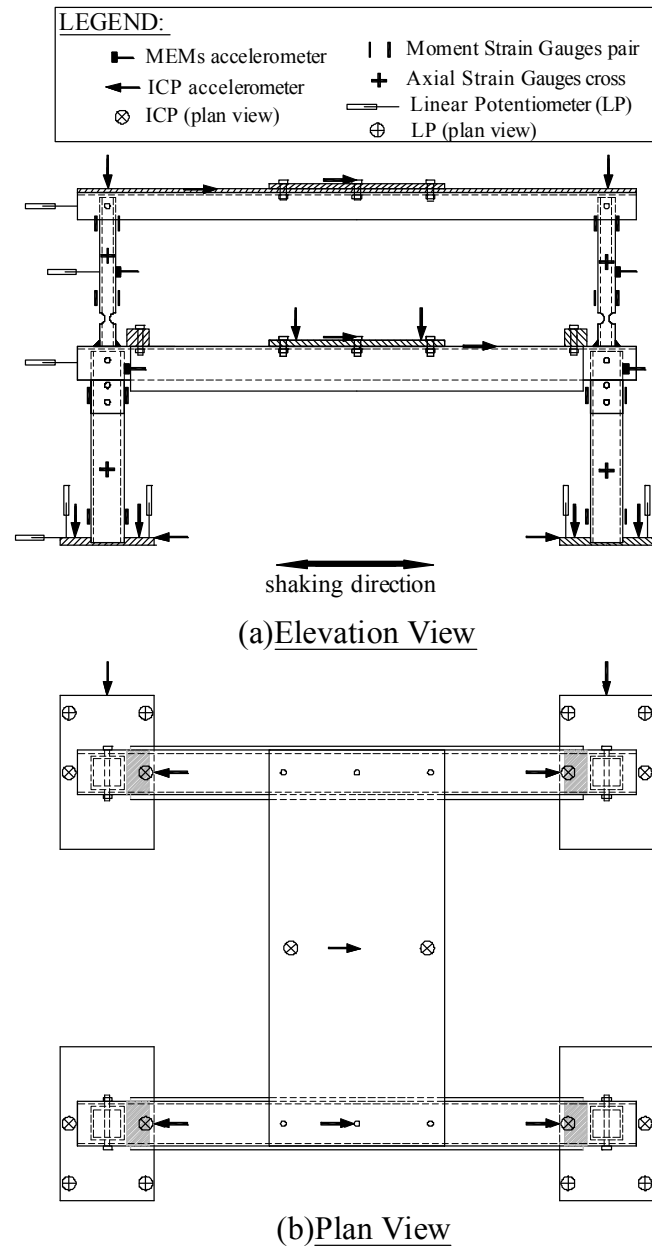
Instrumentation of the BD model: (a) elevation view; (b) plan view
